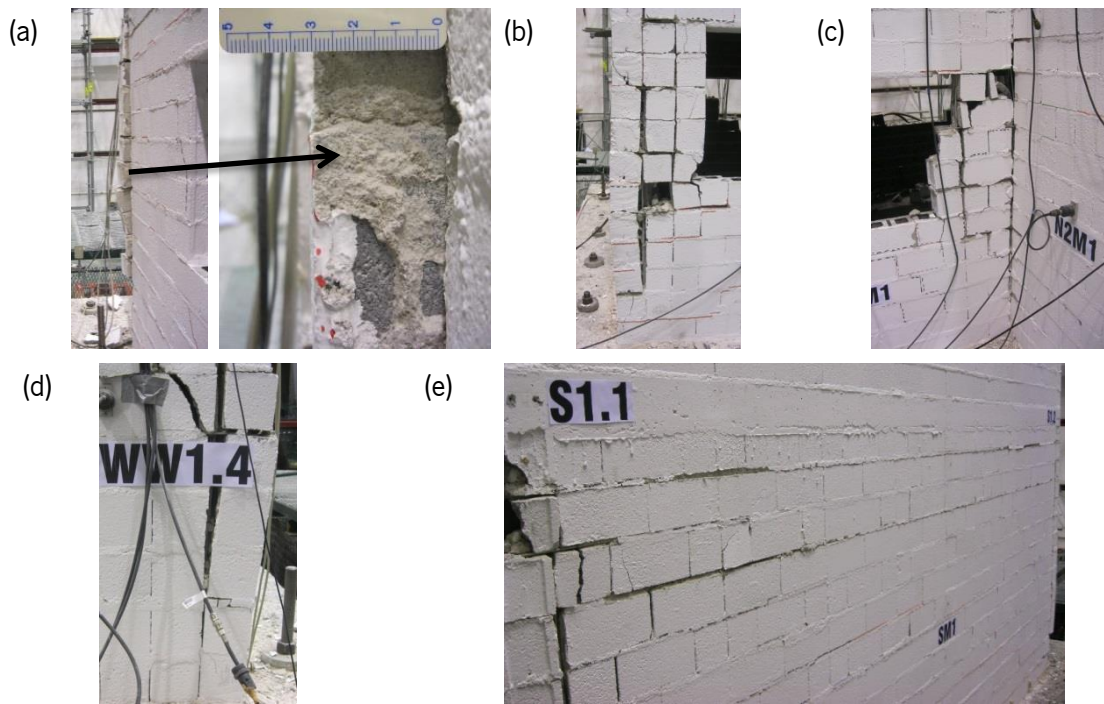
Out-of-plane failures; (a) separation of the north wall at the corner with the east wall; (b) left pier of west 1 wall (c) out-of-plane detachment and separation of the west 1 and north 2 walls; (d) separation between west and south wall; (e) out-of-plane cracking at the south wall
